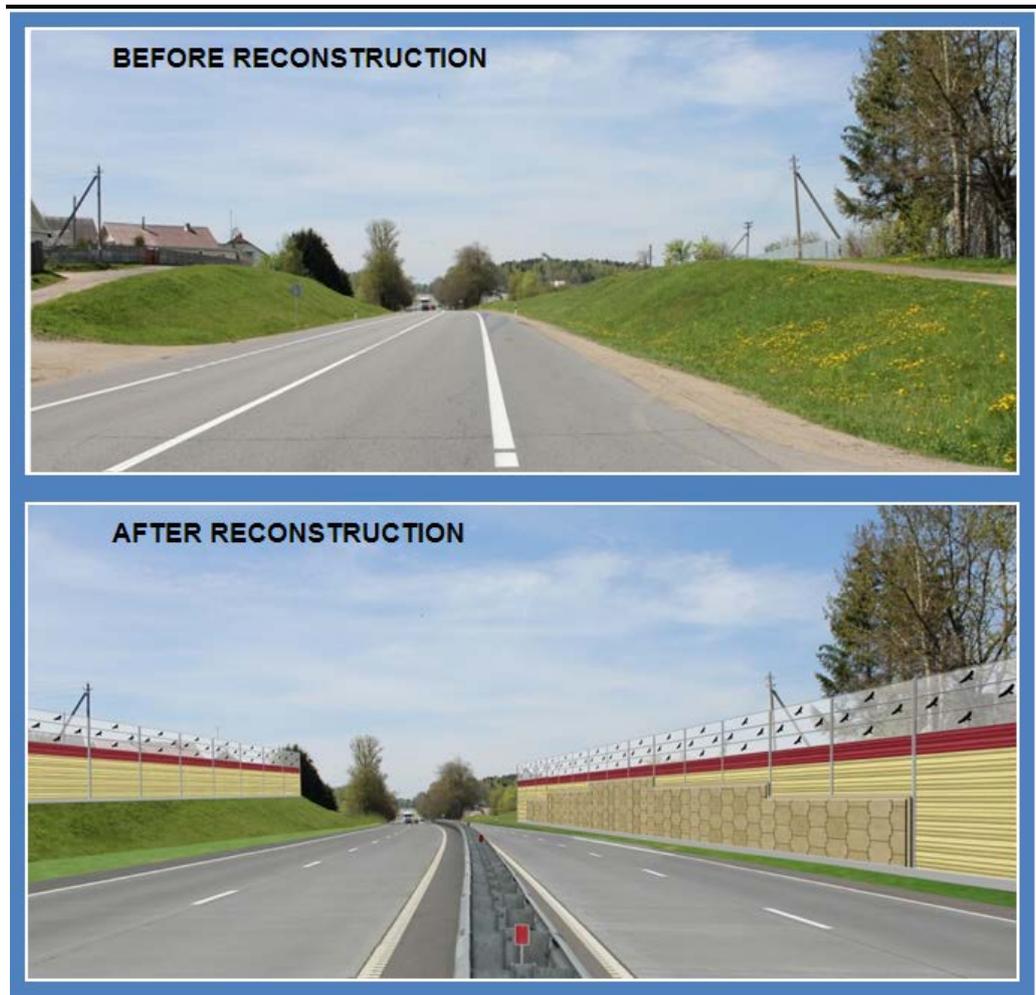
View of the road section before and after the reconstruction and installation of noise shields
